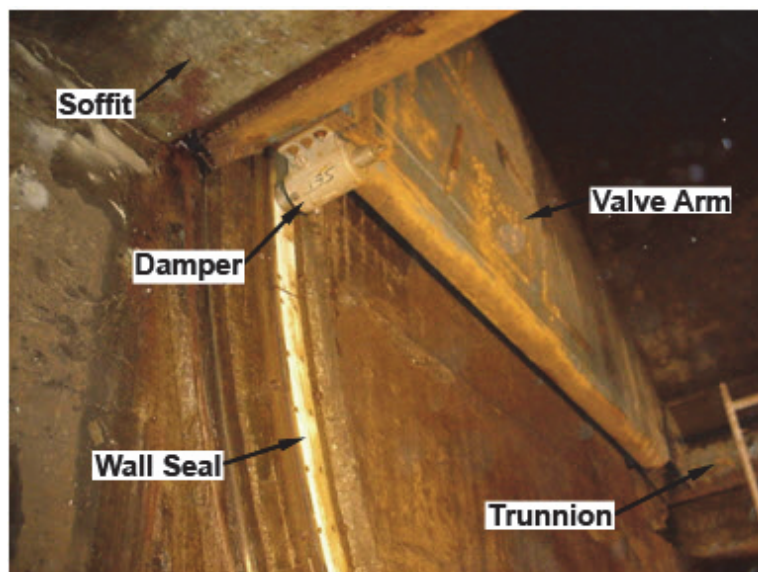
Damper attached to bottom of valve arm, Eisenhower and Snell Locks.
